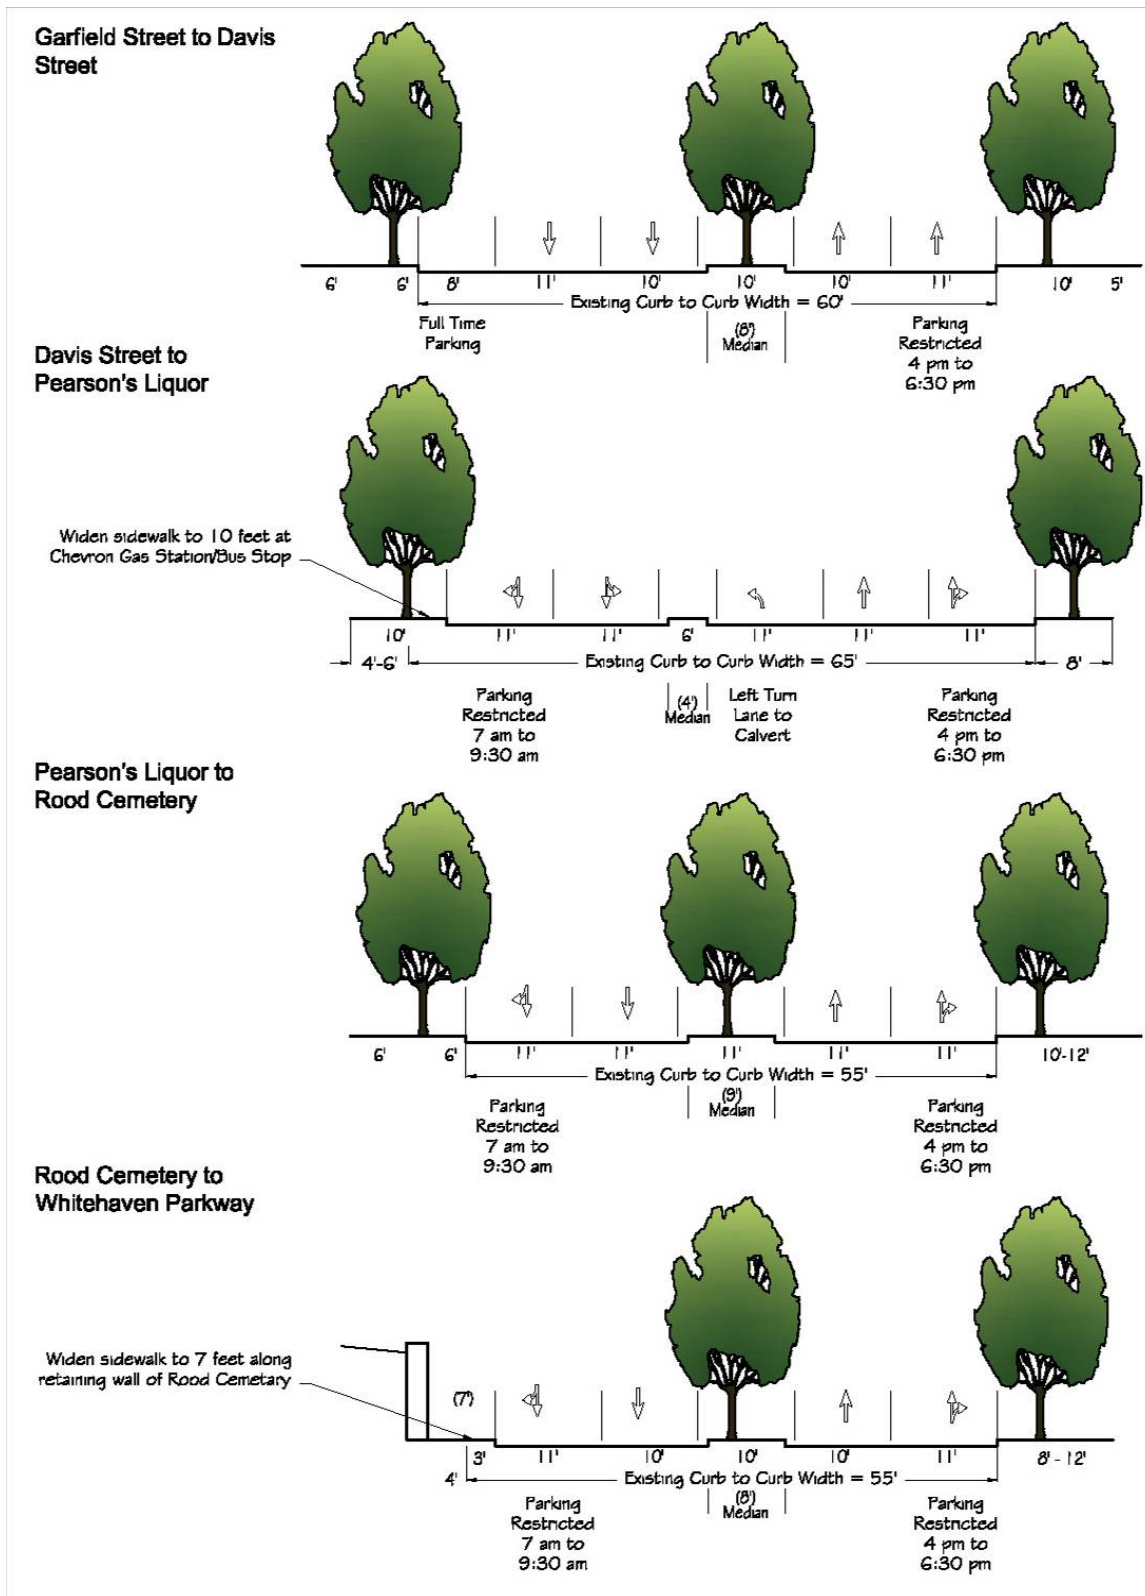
Wisconsin Avenue cross sections depicting selected design alternative for streetscape and operational changes between Garfield Street and Whitehaven Parkway
